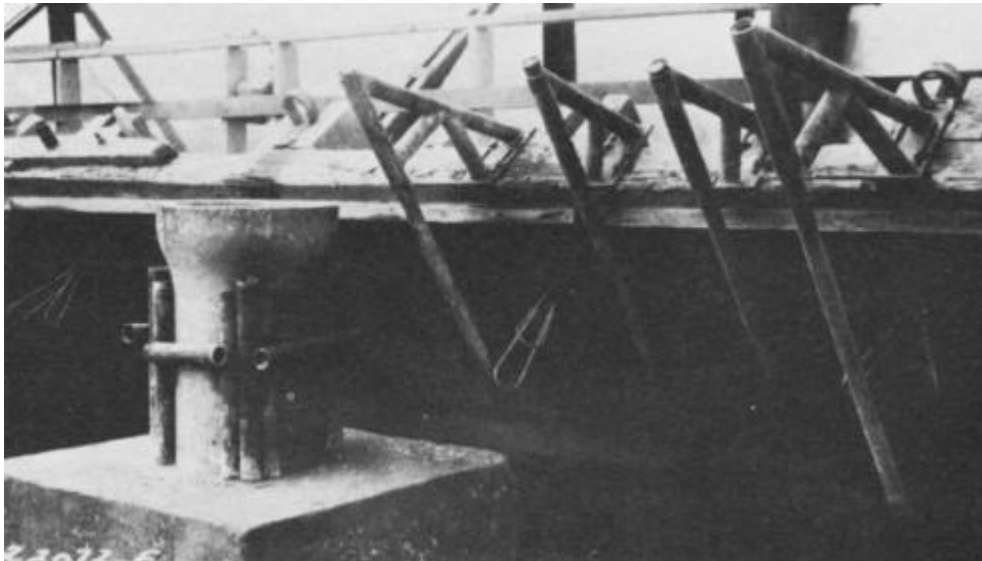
Pipe Brackets for Locating Boundary Strain Meters - Prior to Placing Concrete (courtesy of the Tennessee Valley Authority).
